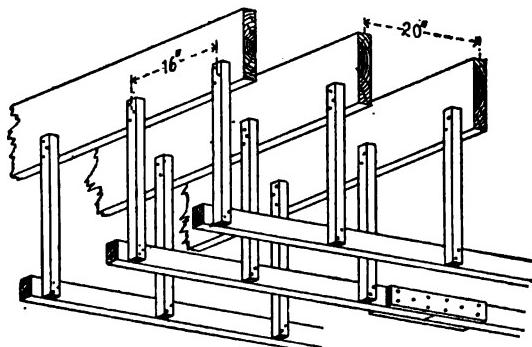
Suspended Ceilings Under Flat Roof. Eastern Method.
